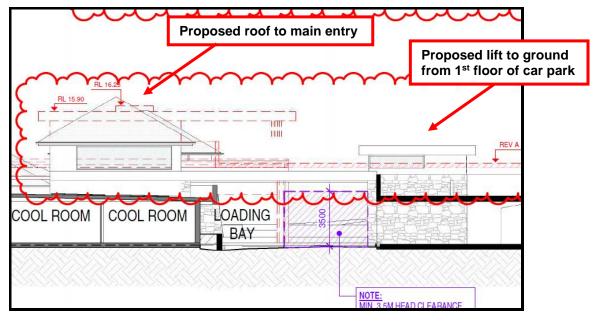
Previous proposed roof over main entry (Source: Innovate, Rev F)
